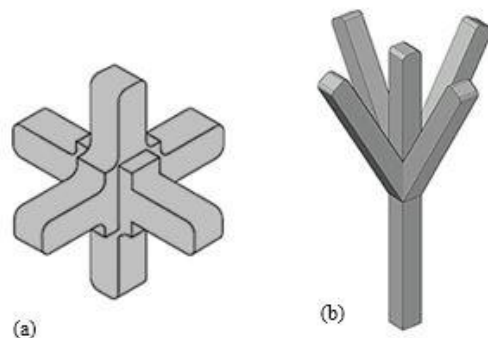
3D view of (a) A-jacks concrete armor block and (b) new F-jacks block
